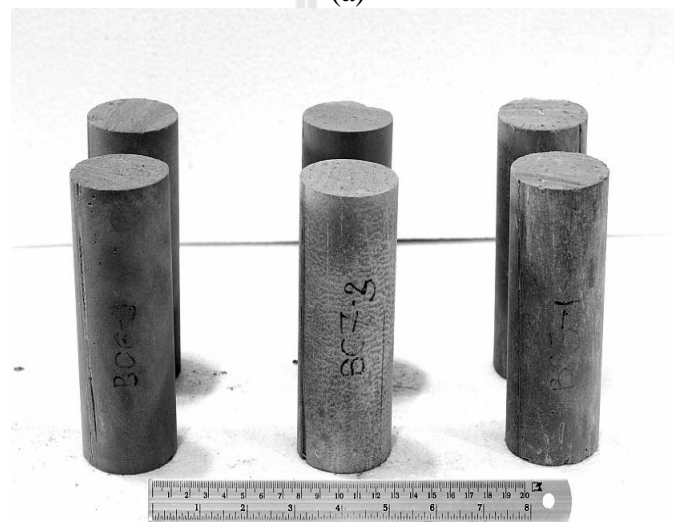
Core sample is cut to obtain the desired length with ZE-LG3-570A Tile Cutter.
